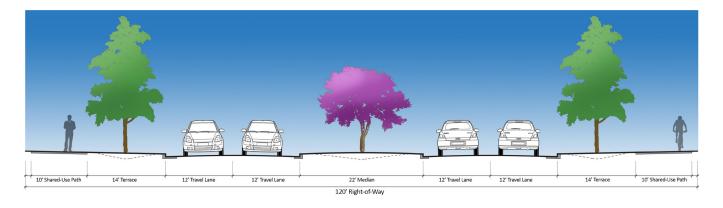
Nelson Road Cross-Section with 120 feet Right-Of-Way, west of Reiner Road
